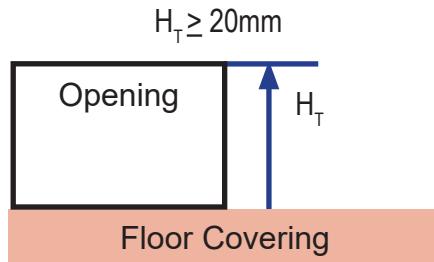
Minimum Height Requirement for Floor-Extending Openings
